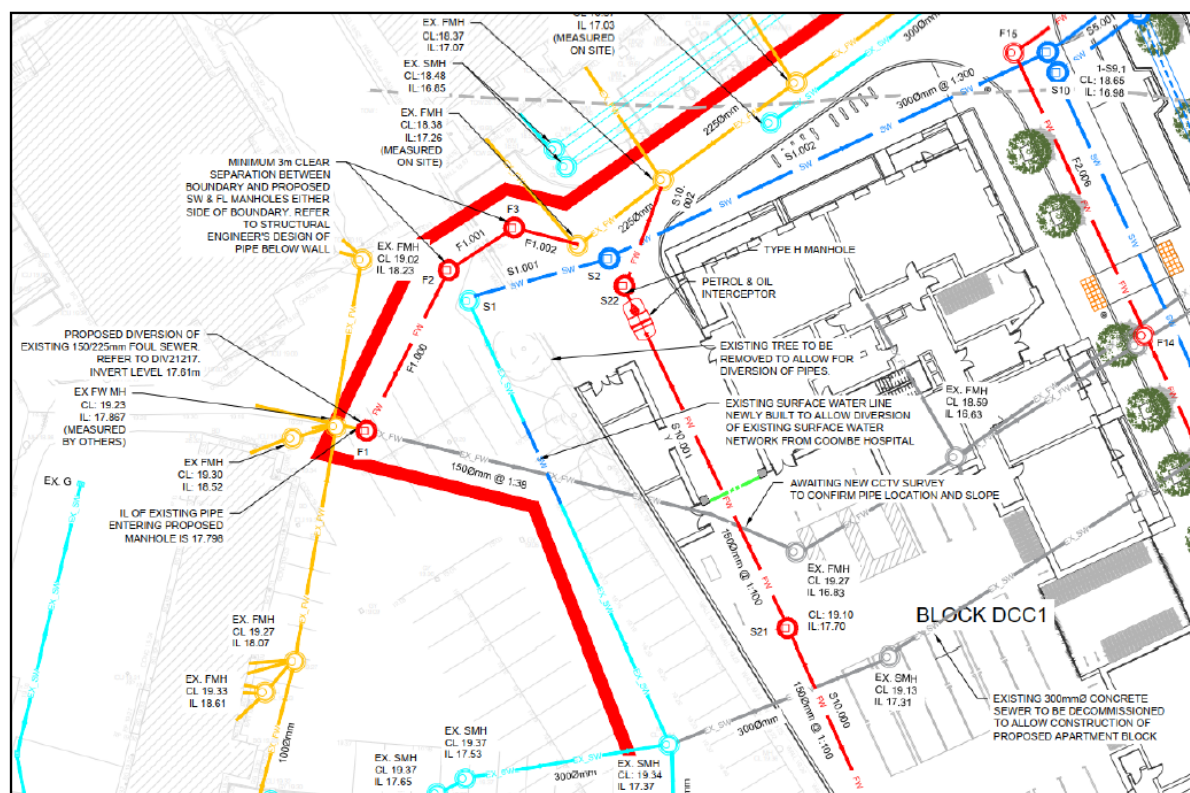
Proposed Wastewater and Surface Water Diversions (Source: AECOM Infrastructure Report 2022)
